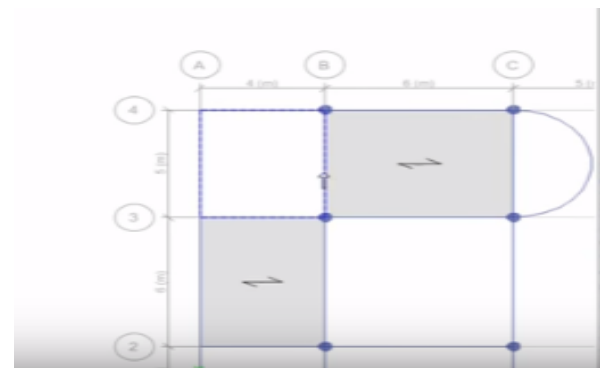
PLANE VIEW OF THE RC FRAME BUILDING
